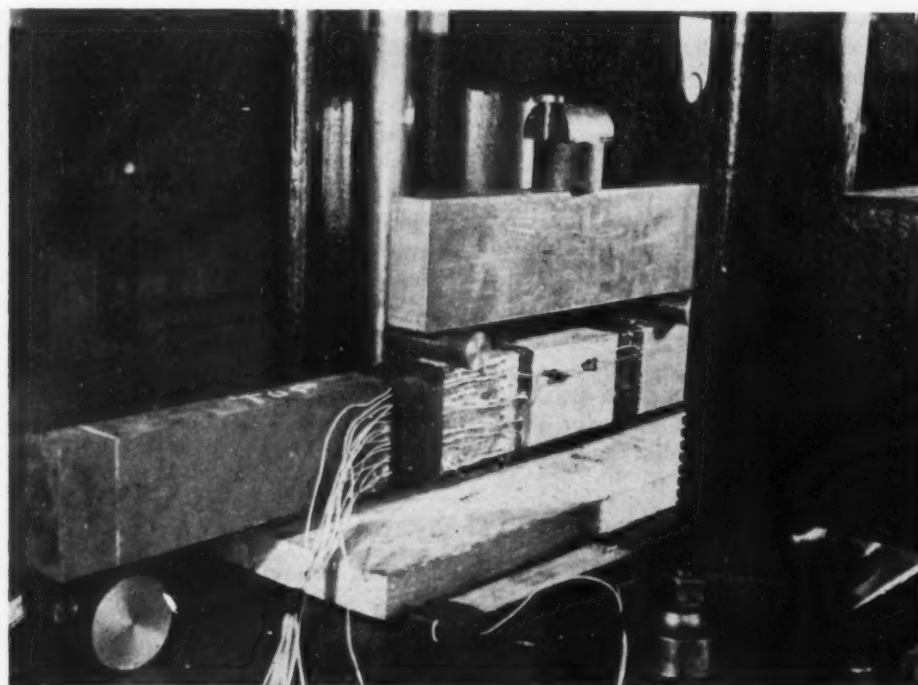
Specimen mounted in testing machine with gages attached. The bar shown is a 2x4x52 in. sample.
